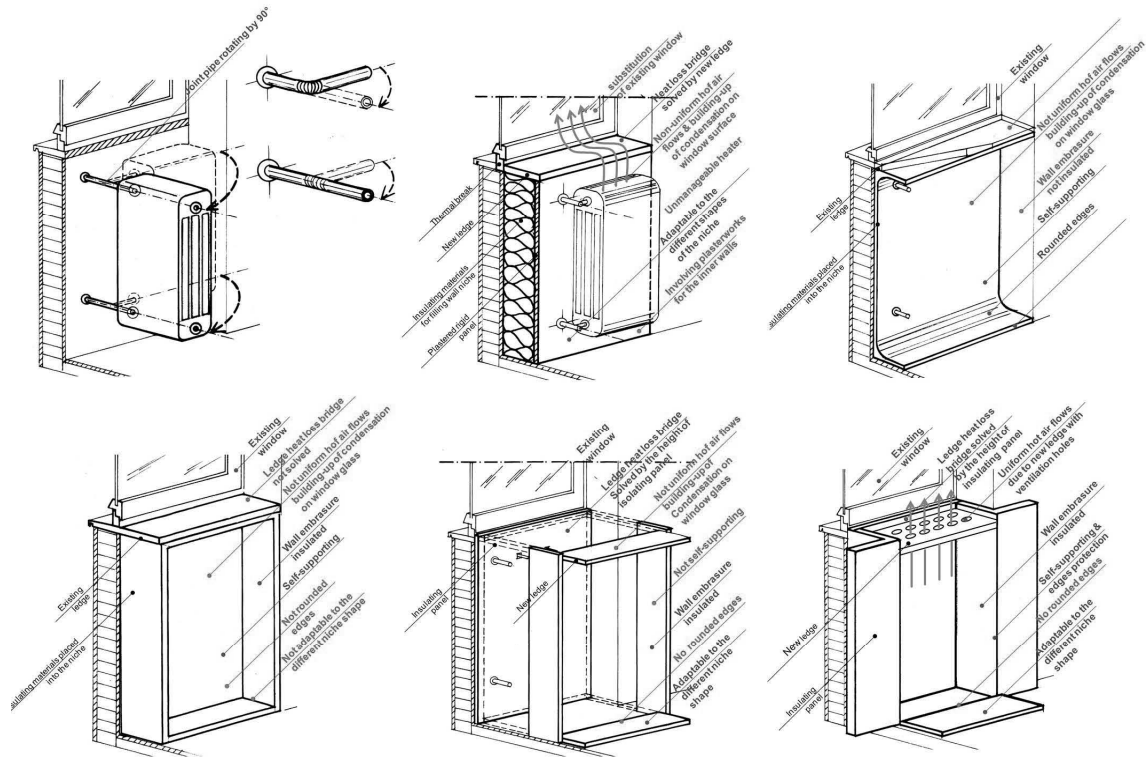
Meta-project sketches under development in order to outline innovative building components for building part wall under the window
